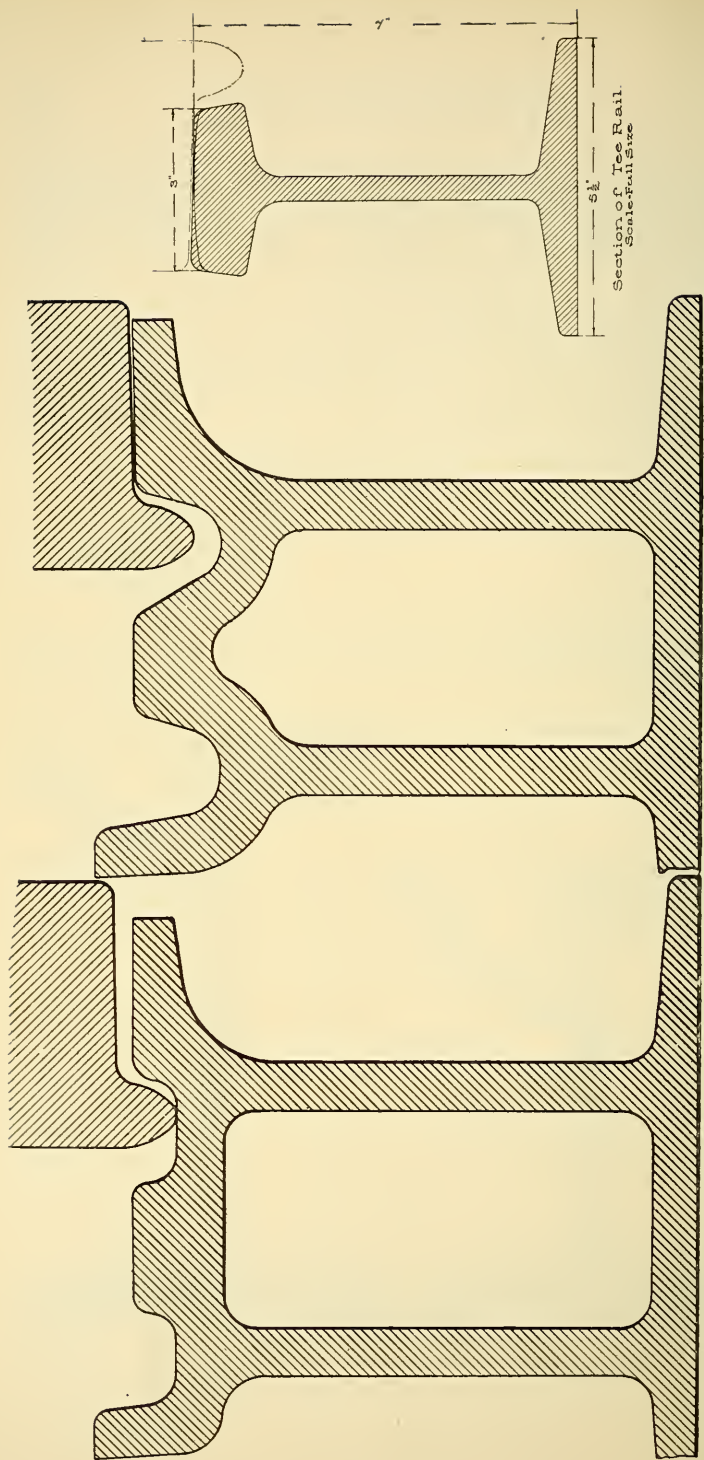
Present Special Work Groove, showing Wheel Riding on Flange.
